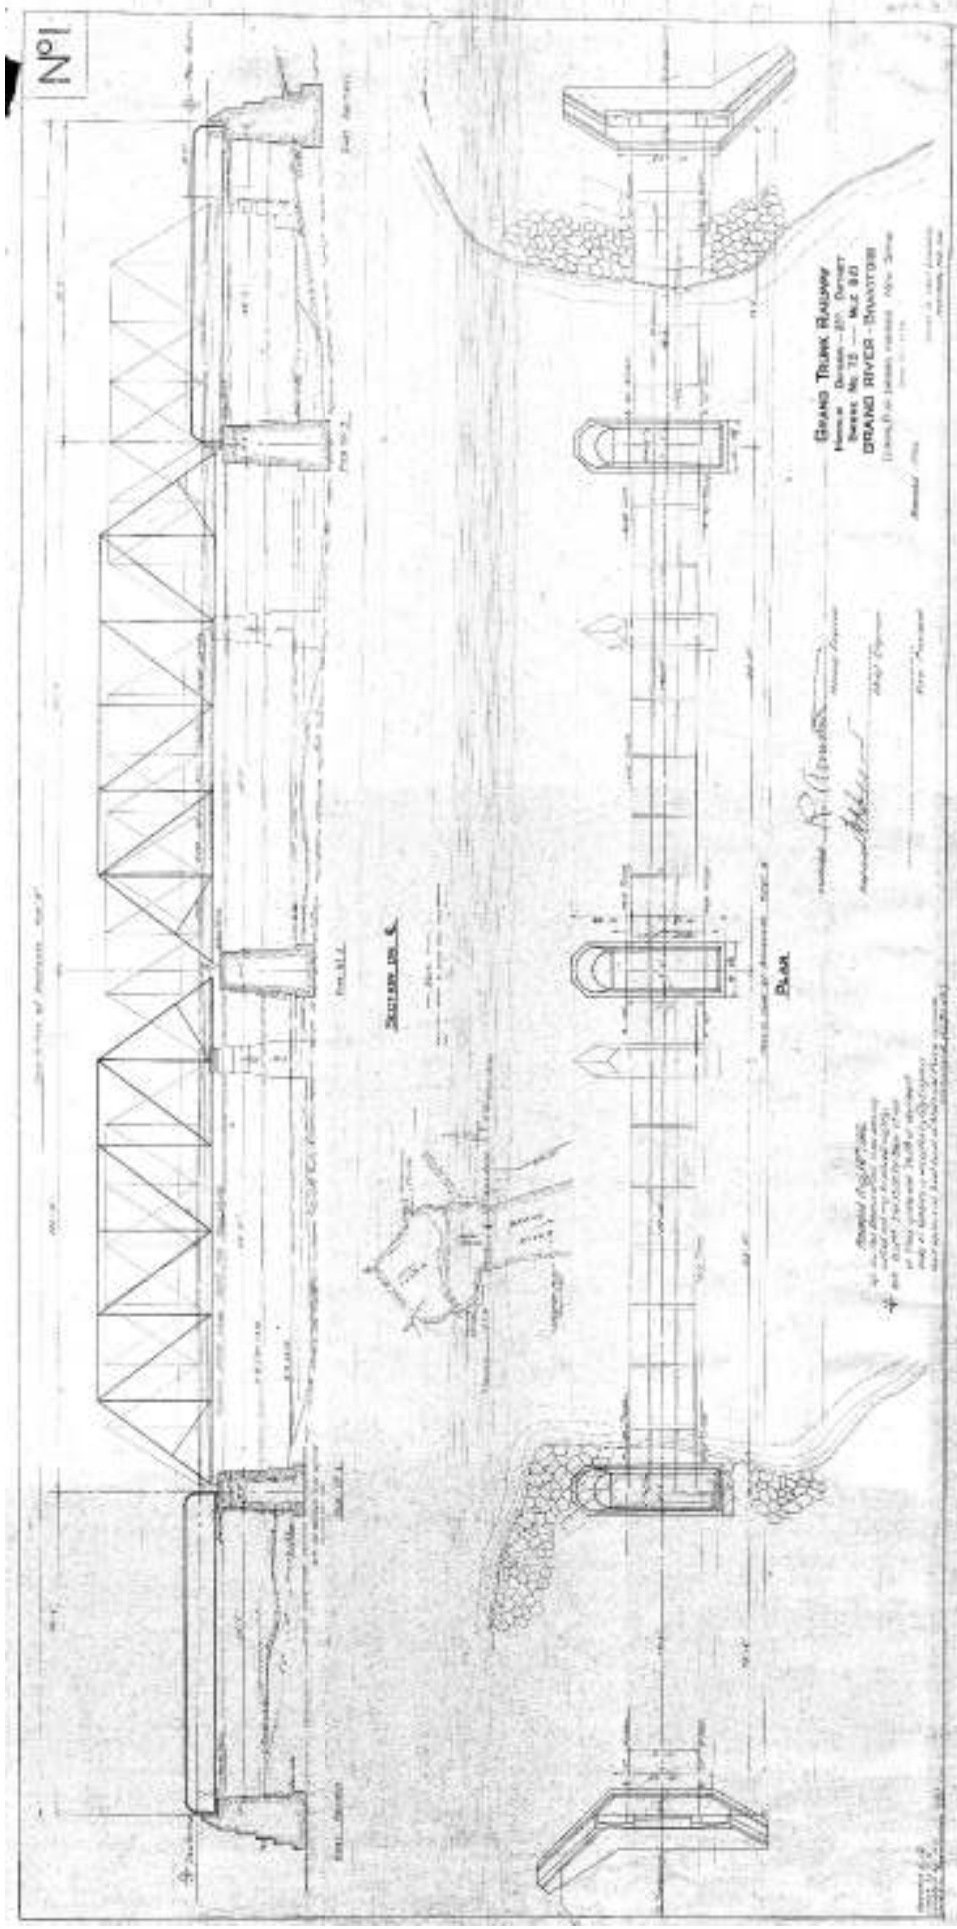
Plan and elevation proposed for the Brant's Crossing Bridge, February 1912
